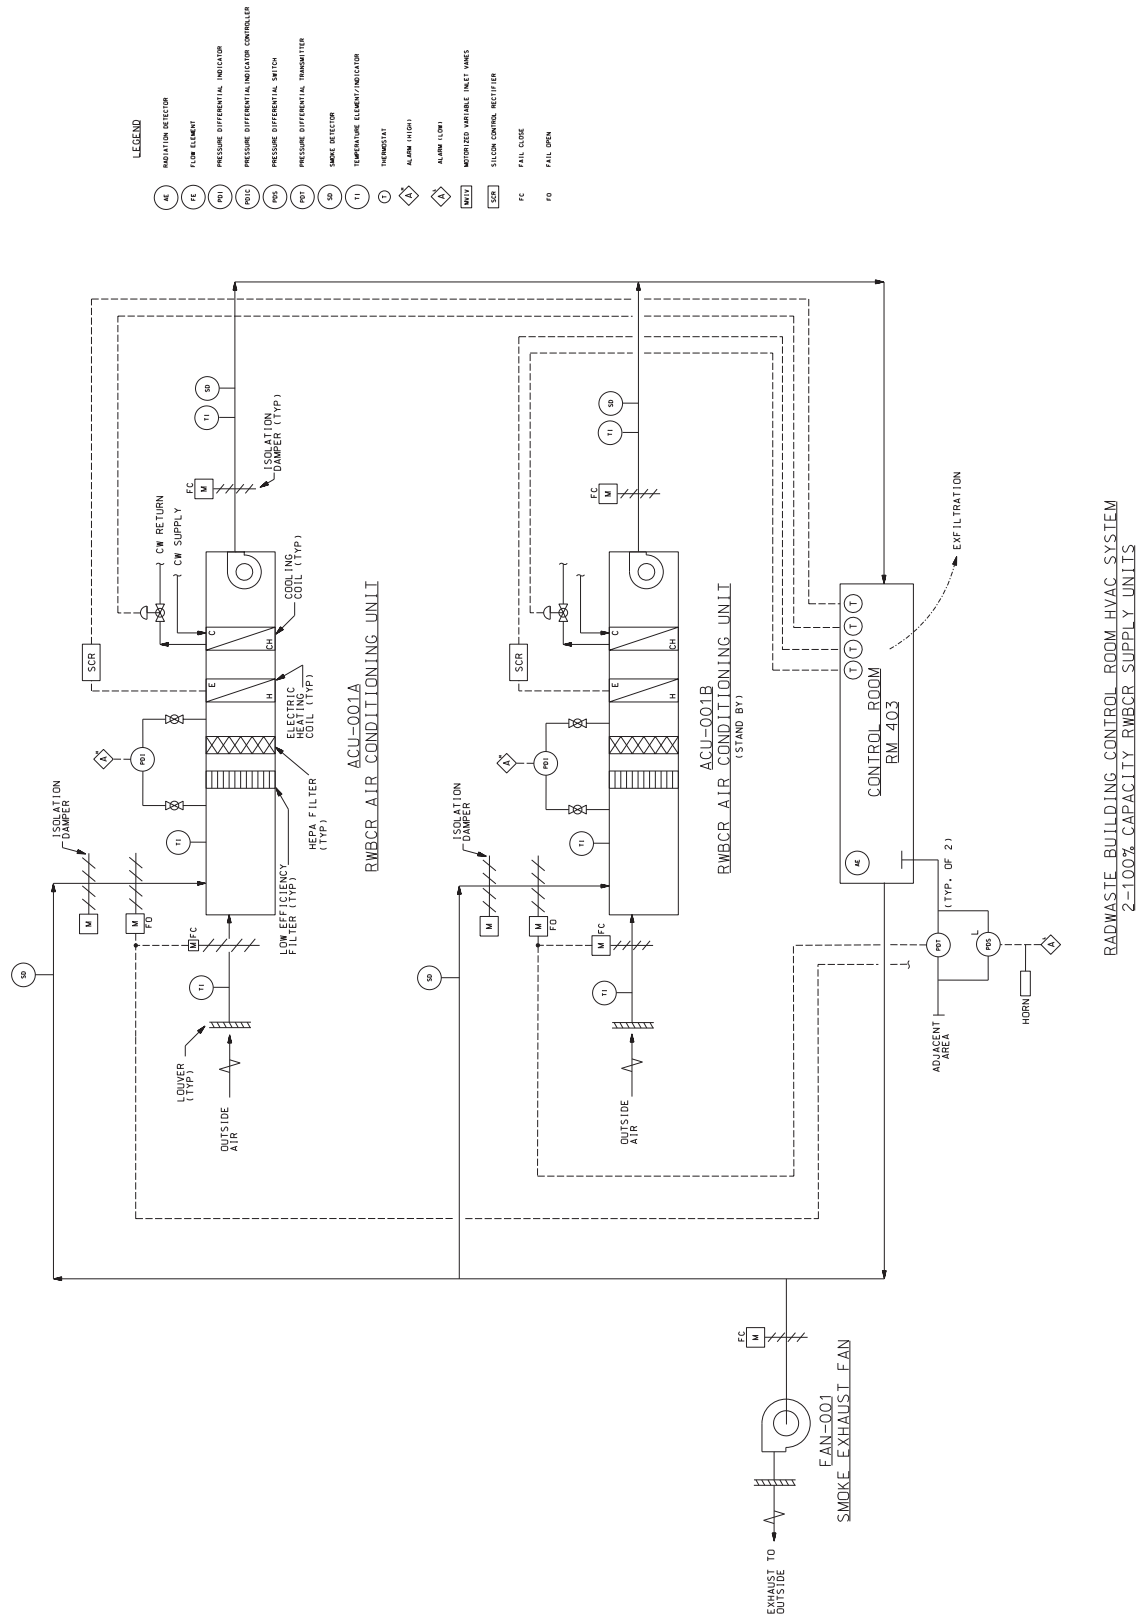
Radwaste Building HVAC P&amp;ID (Sheet 1 of 3)
